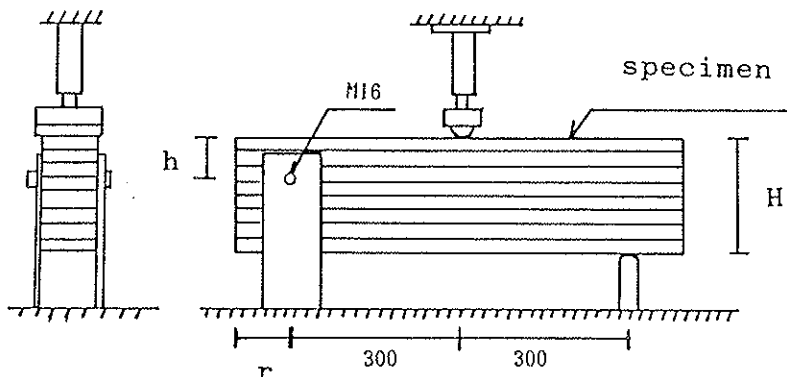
Shear test of the bolted joints perpendicular to the grain by bending
